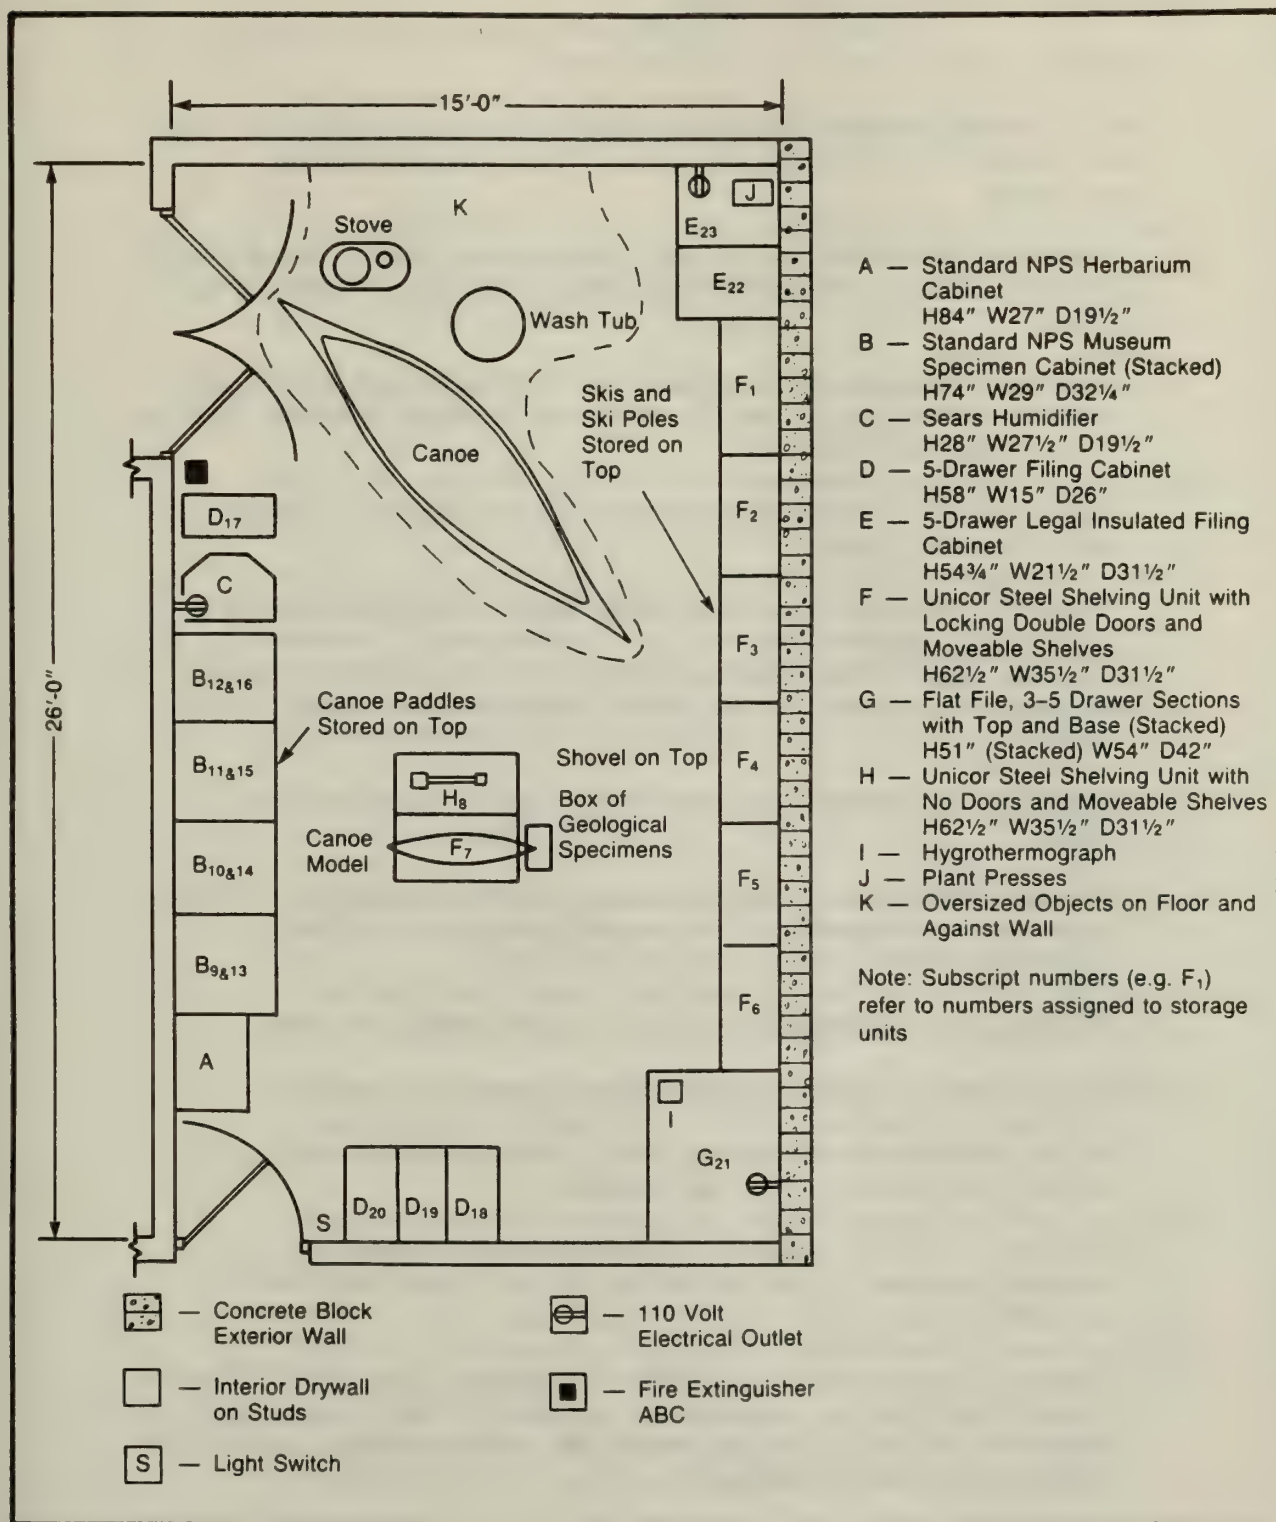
Floor Plan of Museum Collection Storage Room at Voyageurs National Park (Scale: ¼"=1'0"). Floor plan shows existing museum equipment and oversized objects.
